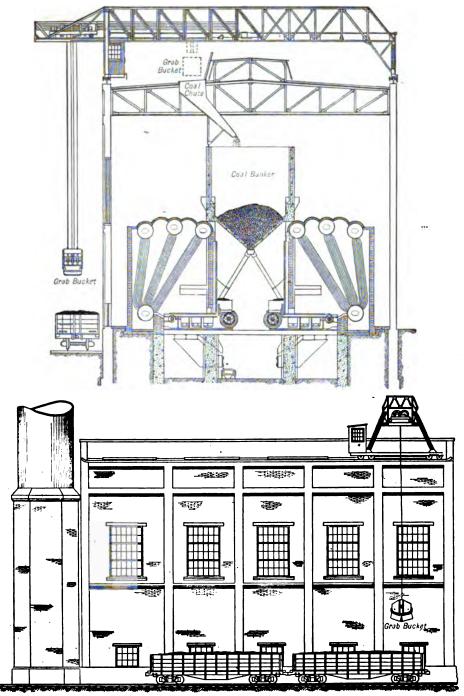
JEFFREY COAL HANDLING EQUIPMENT.
